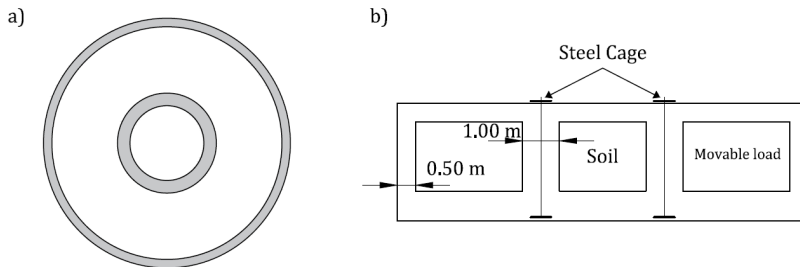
Foundation footing with active stabilization system: a) plan view; b) cross section [5]
